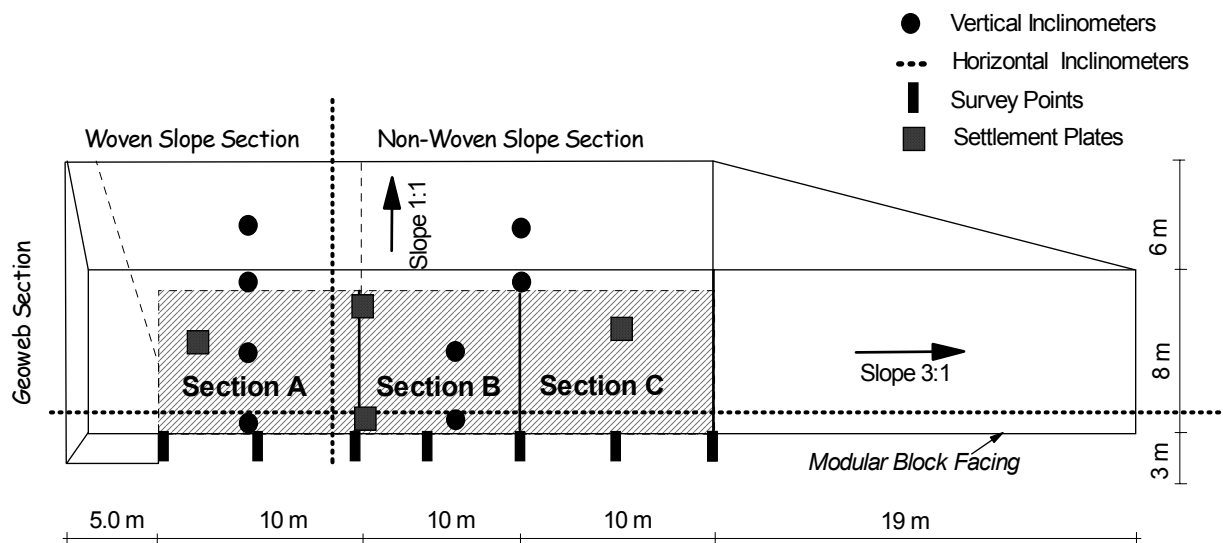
Plan of the wall showing the instrumentation at different locations with in the wall (Farrag, 2003).
